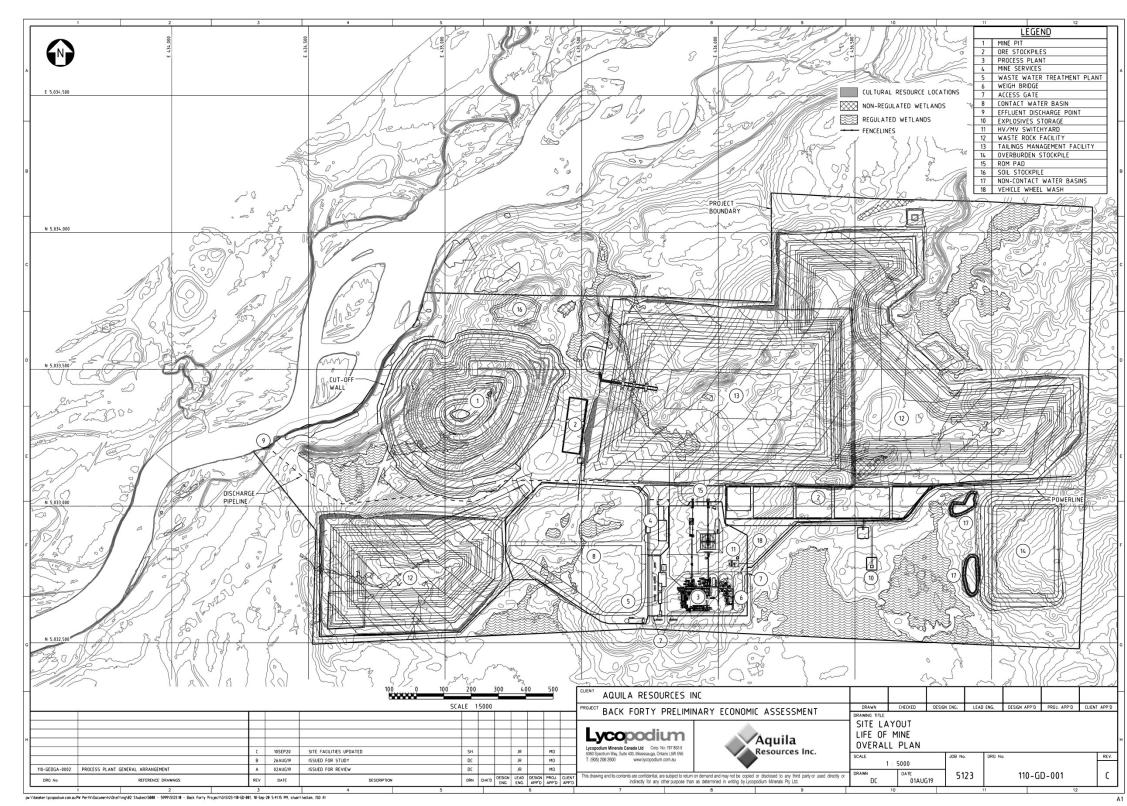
OVERALL PROJECT SITE PLAN
